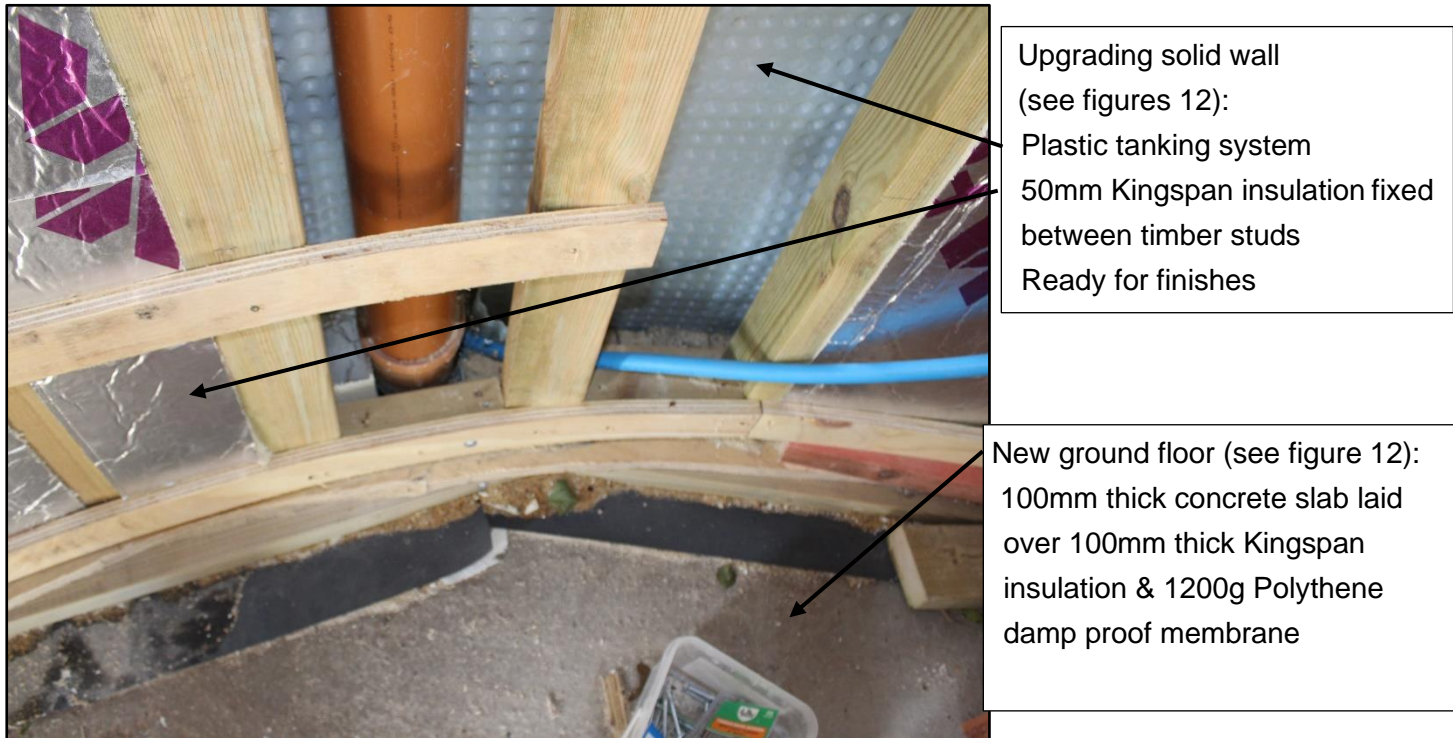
New non-vapour permeable concrete floor, laid over polythene membrane and tanking membrane applied to walls (Source: Gwynne 2018).
